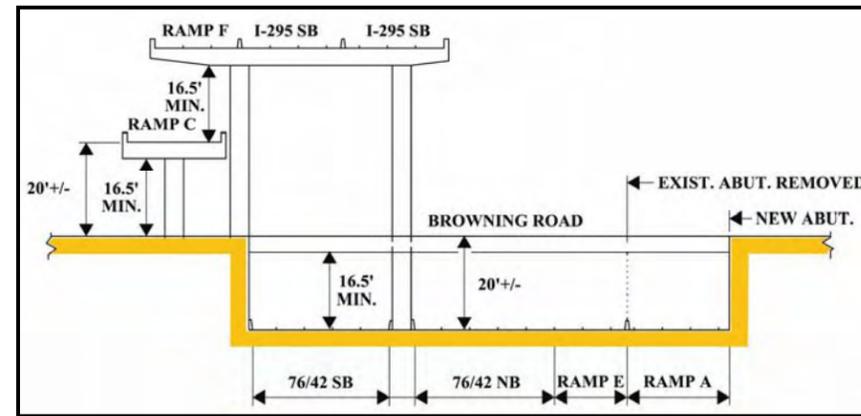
Section A-A at Browning Road (Alternative C)
